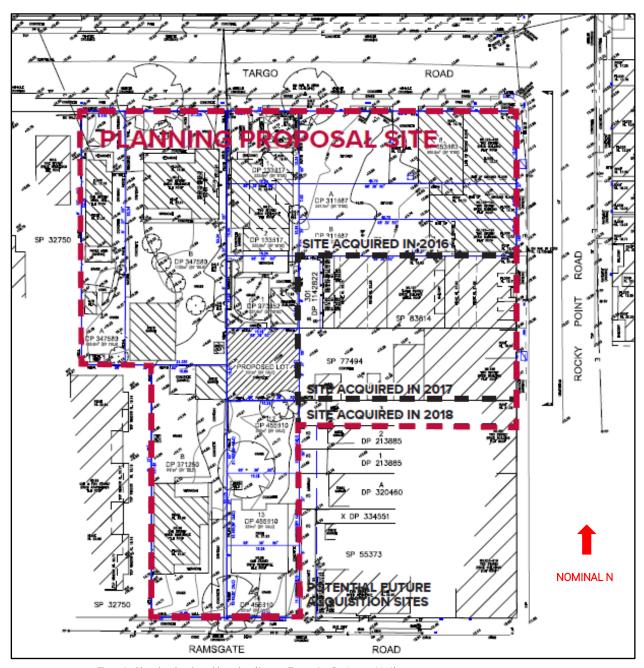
Plan showing the subject site. (Source: Turner Studio, August 2019)
